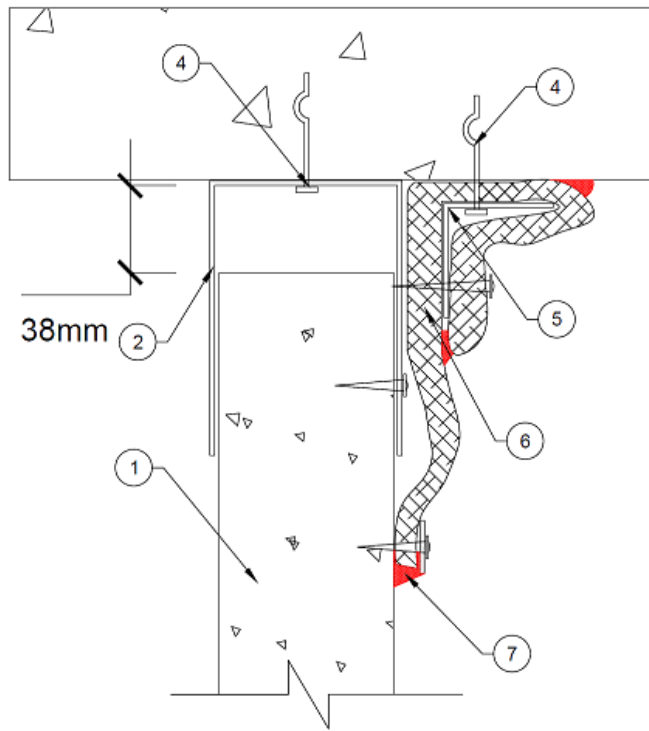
Head Detail 1 of the Wall with Initial Gap Size
